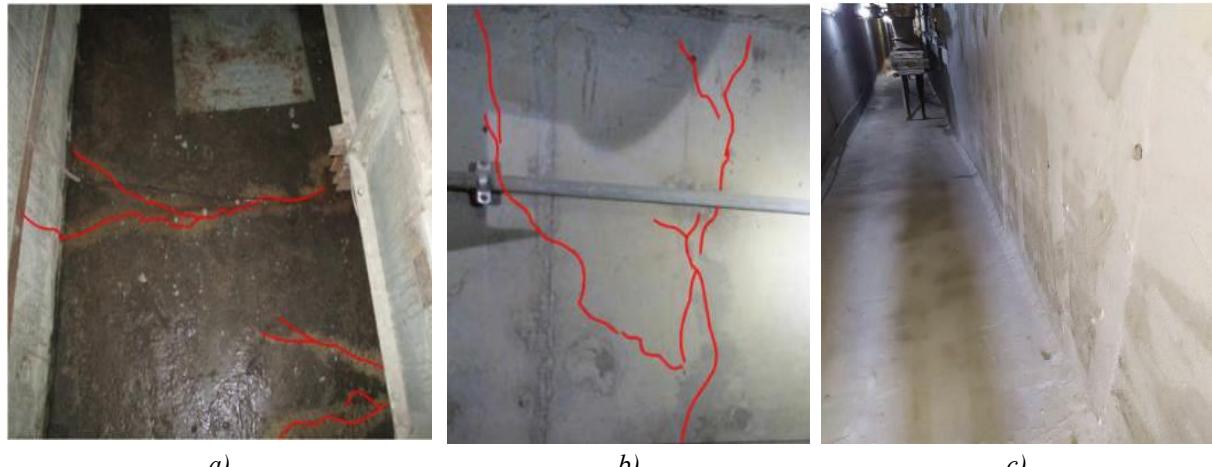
Condition of the underground galleries: a) floor cracks as recorded during the survey; b) wall cracks as recorded during the survey; c) walls and floor after completion of the repair works
